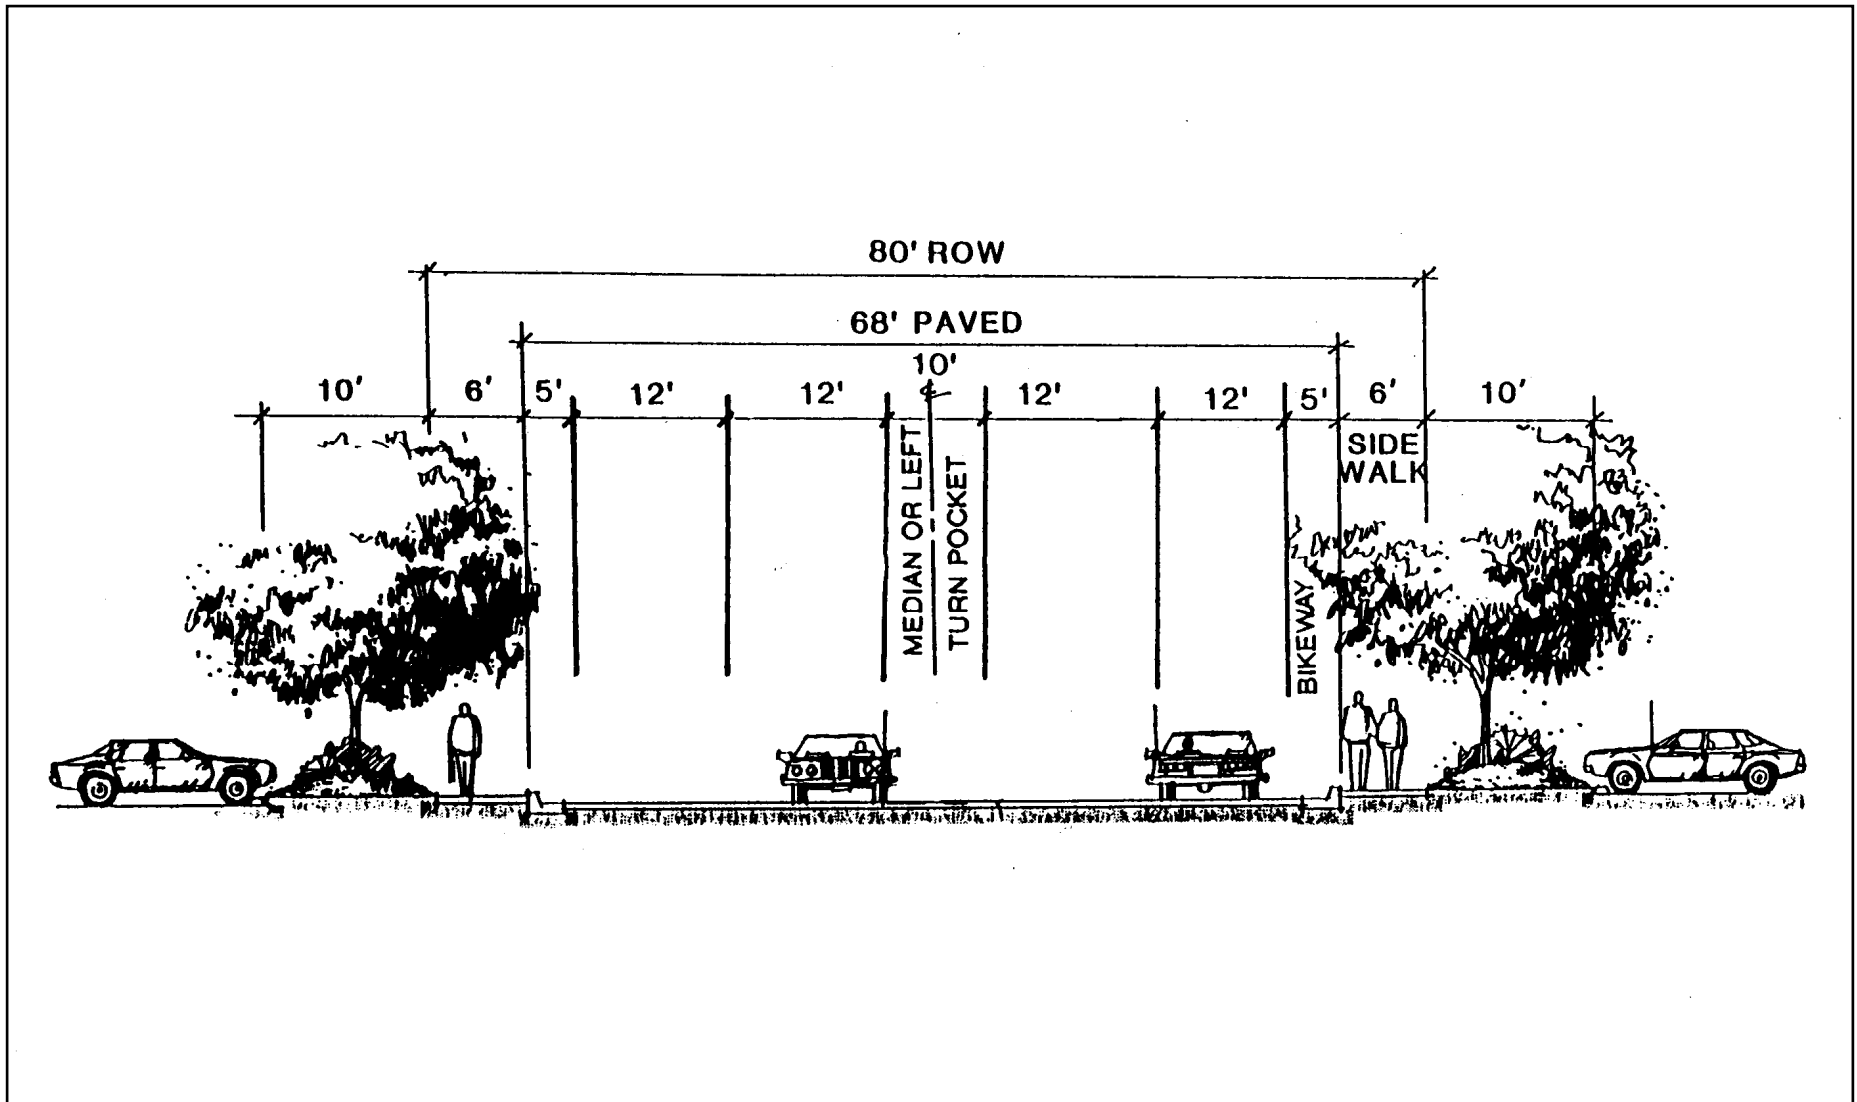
TYPICAL SECTION -- ACACIA STREET
